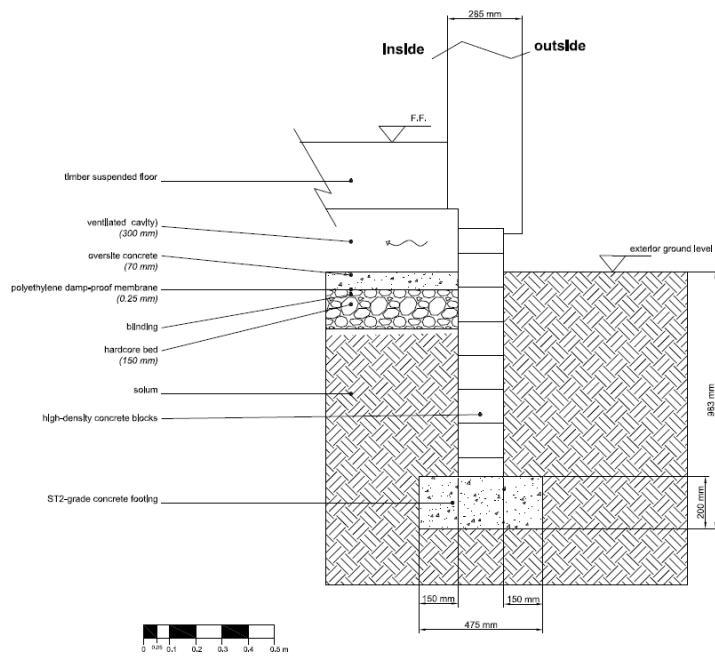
Foundation E (strip foundations and suspended floor), vertical section.
